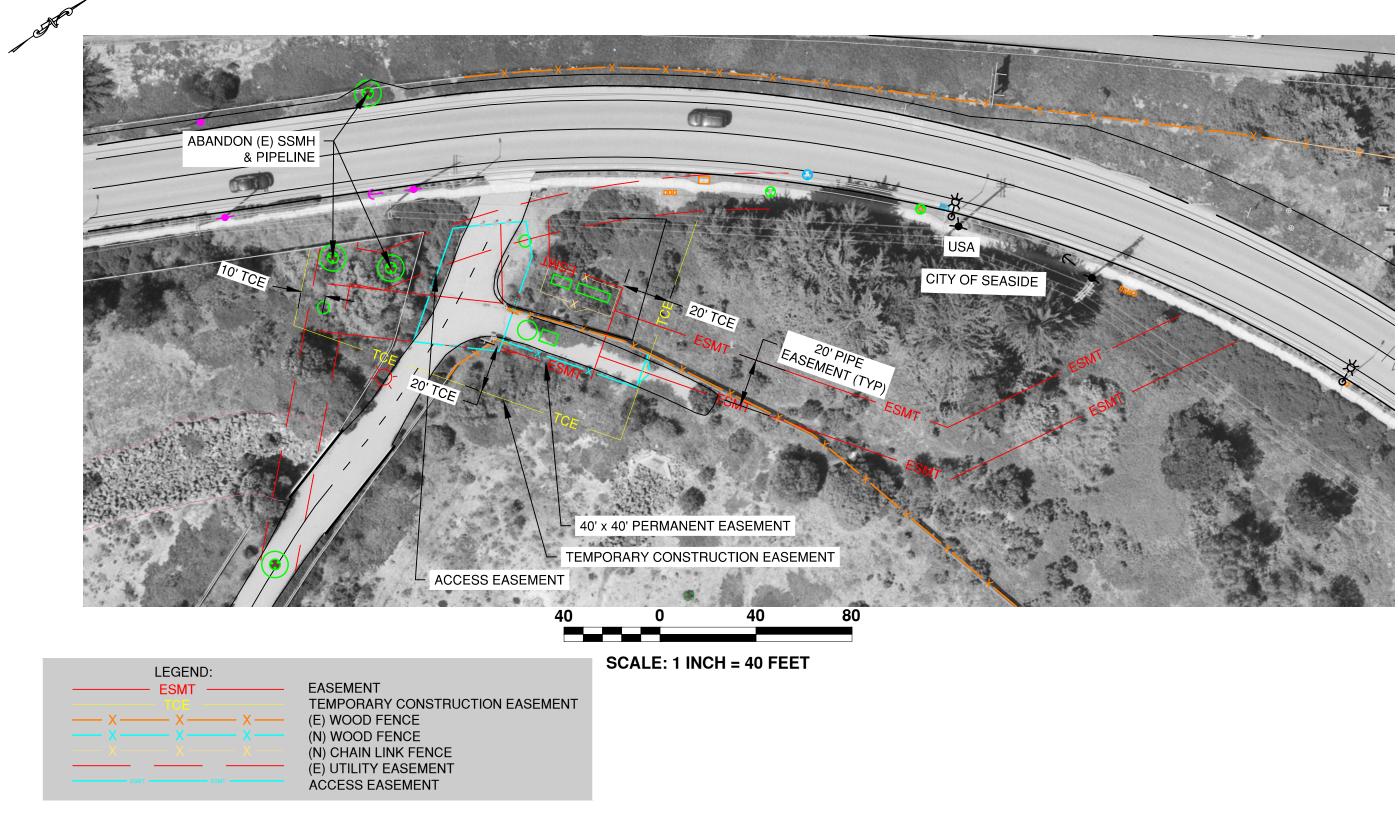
MCWD ORD VILLAGE SITE PLAN (AERIAL PHOTO)
